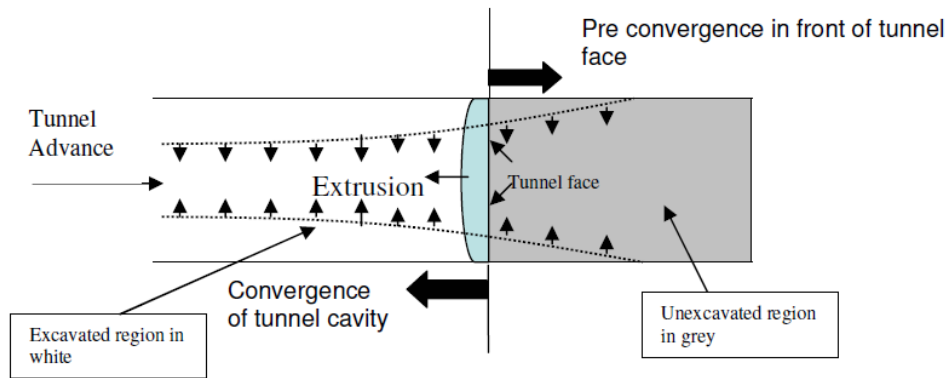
Deformation during tunnel excavation (Tan, 2005)
